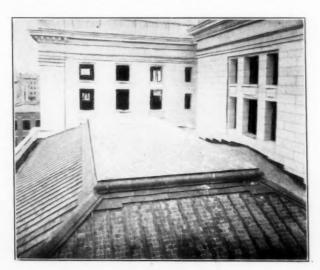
DETAIL BY ROOT & SIEMENS, ARCHITECTS. The Northwestern Terra Cotta Co., Makers.
